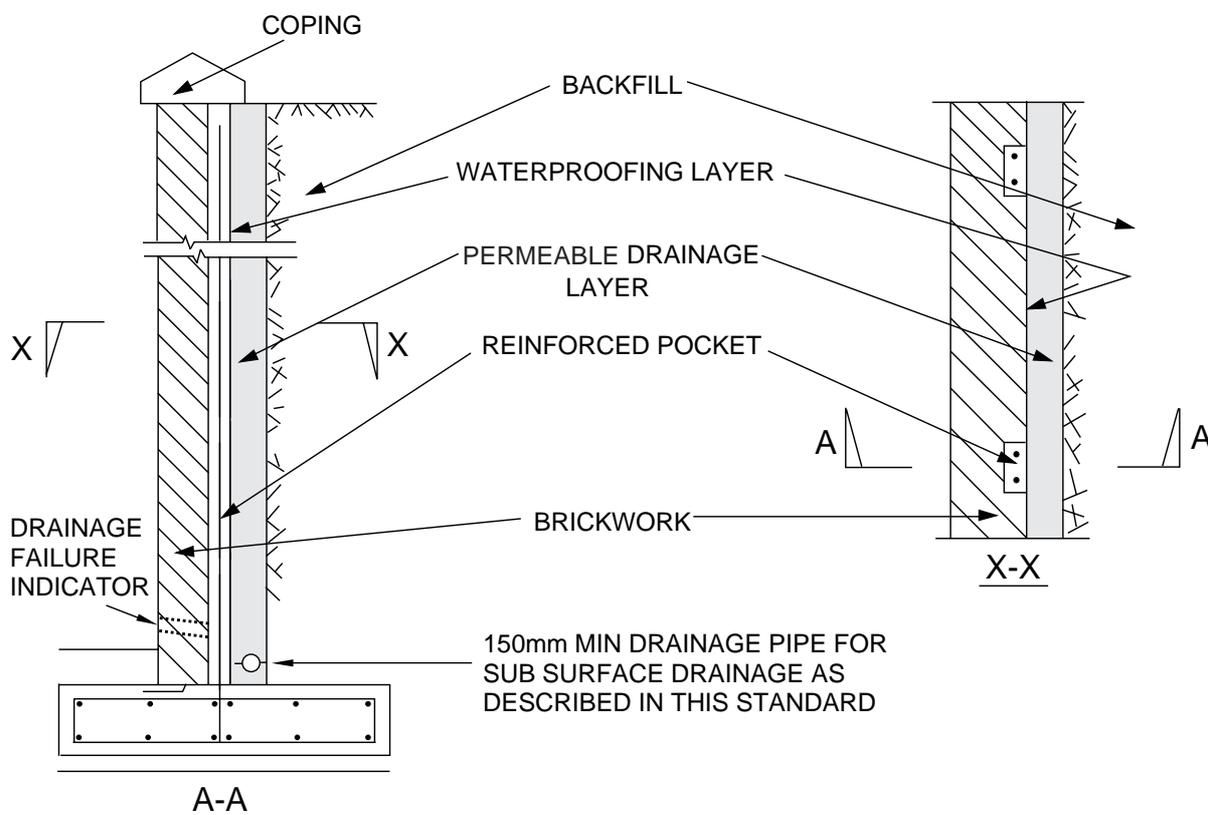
Pocket-type reinforced clay brickwork retaining wall
